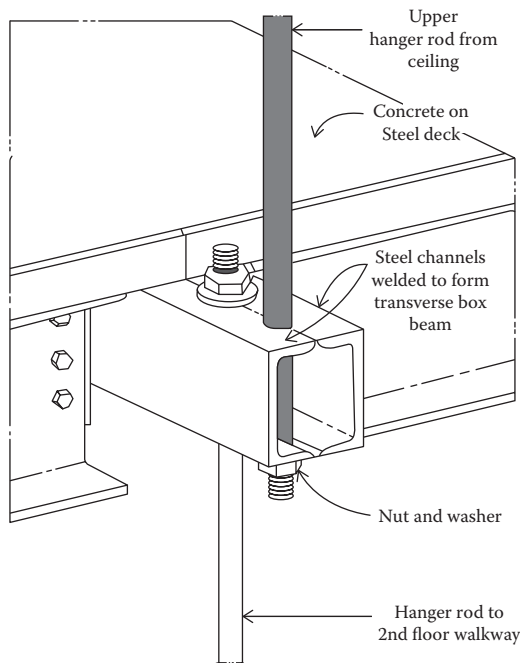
Box beam hanger detail: as built, Hyatt Regency Hotel.
